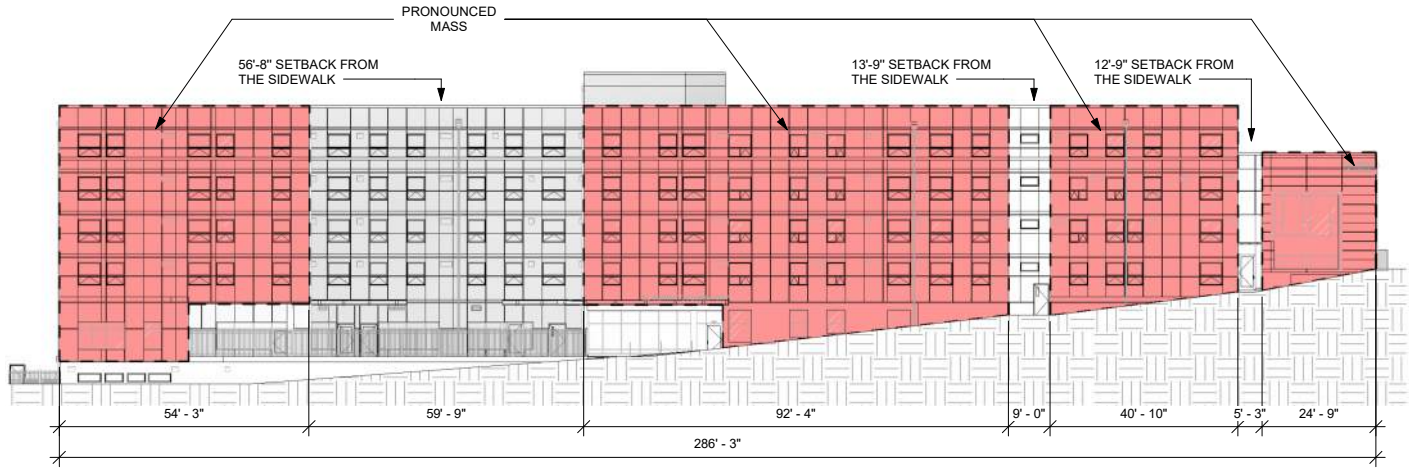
Elevation view of principal building massing highlighted to show how location of courtyard recess helps break up building.
